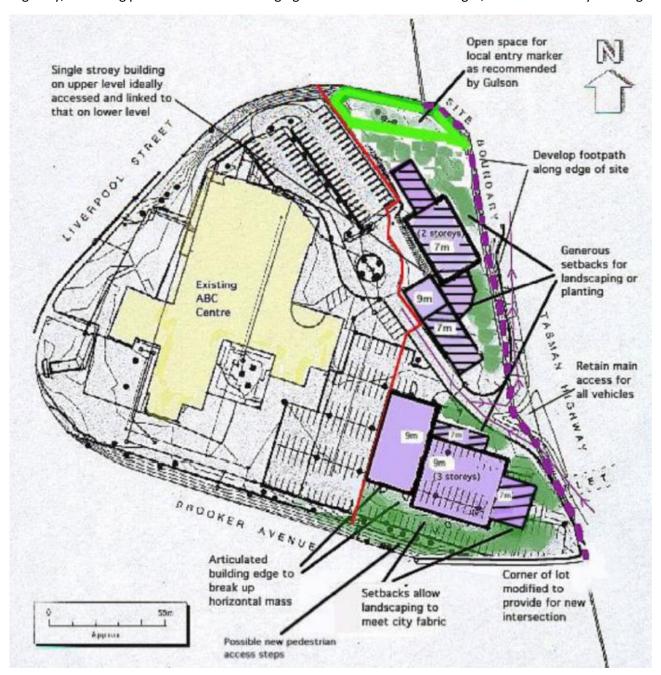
Extract of the SDP for the ABC Site (source: Site Development Plan, Risby 2024)
